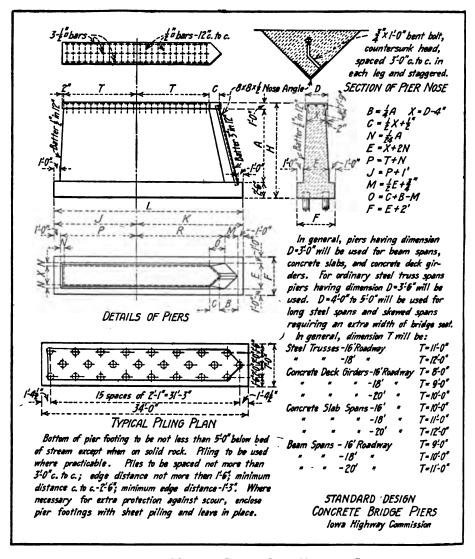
STANDARD MASONRY PIERS. IOWA HIGHWAY COMMISSION.
